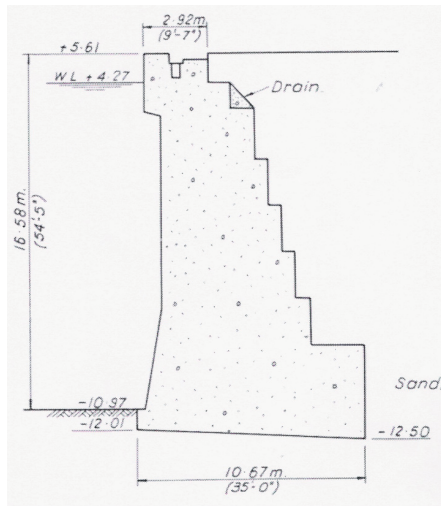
Cross-section of quay wall Sixth dock Antwerp 1960 [Berlin & Partners 1970]
